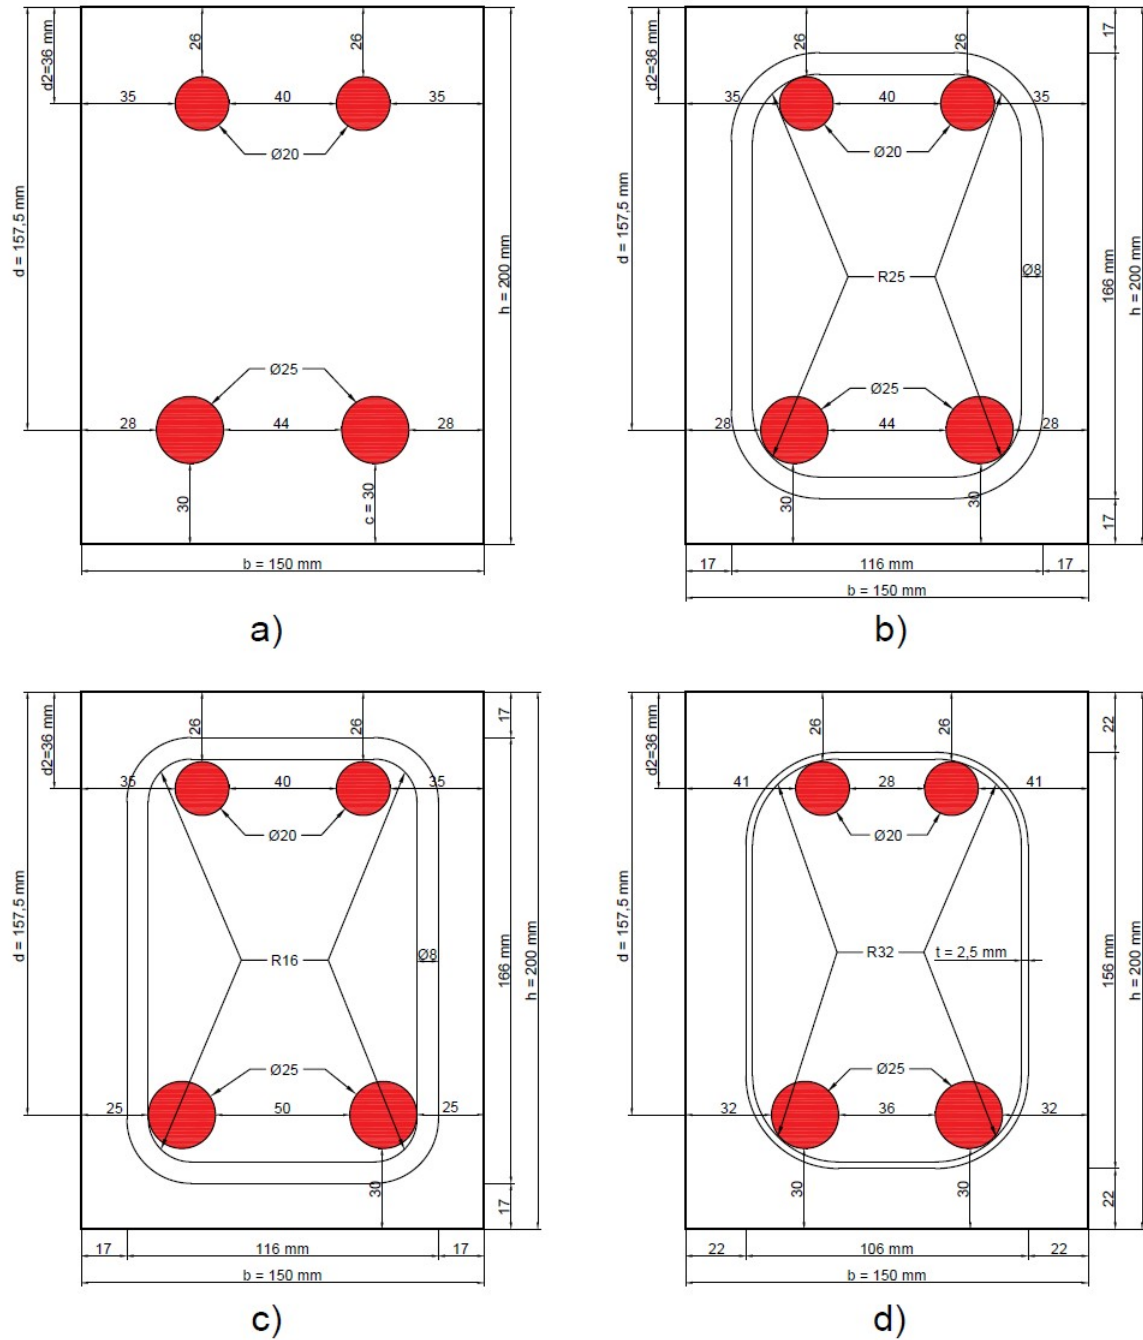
Beam cross-sections: a) Control beam without stirrups; b) Control beam with $\varnothing 8 \text{ mm}$ steel stirrups; c) Beam with $\varnothing 8 \text{ mm}$ braided BFRP stirrups; d) Beam with laminated BFRP UD-fibre strip stirrups.
